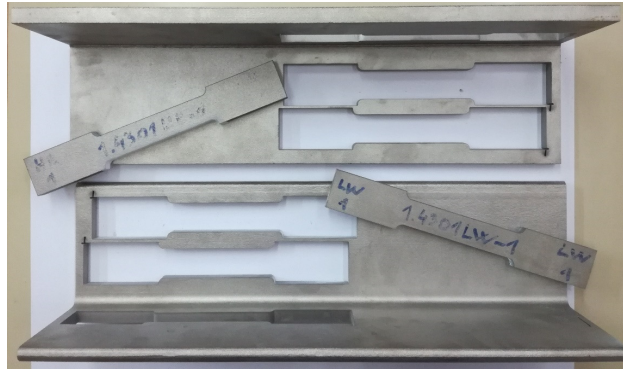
Location of coupons from hot-rolled and laser-welded angle specimens
